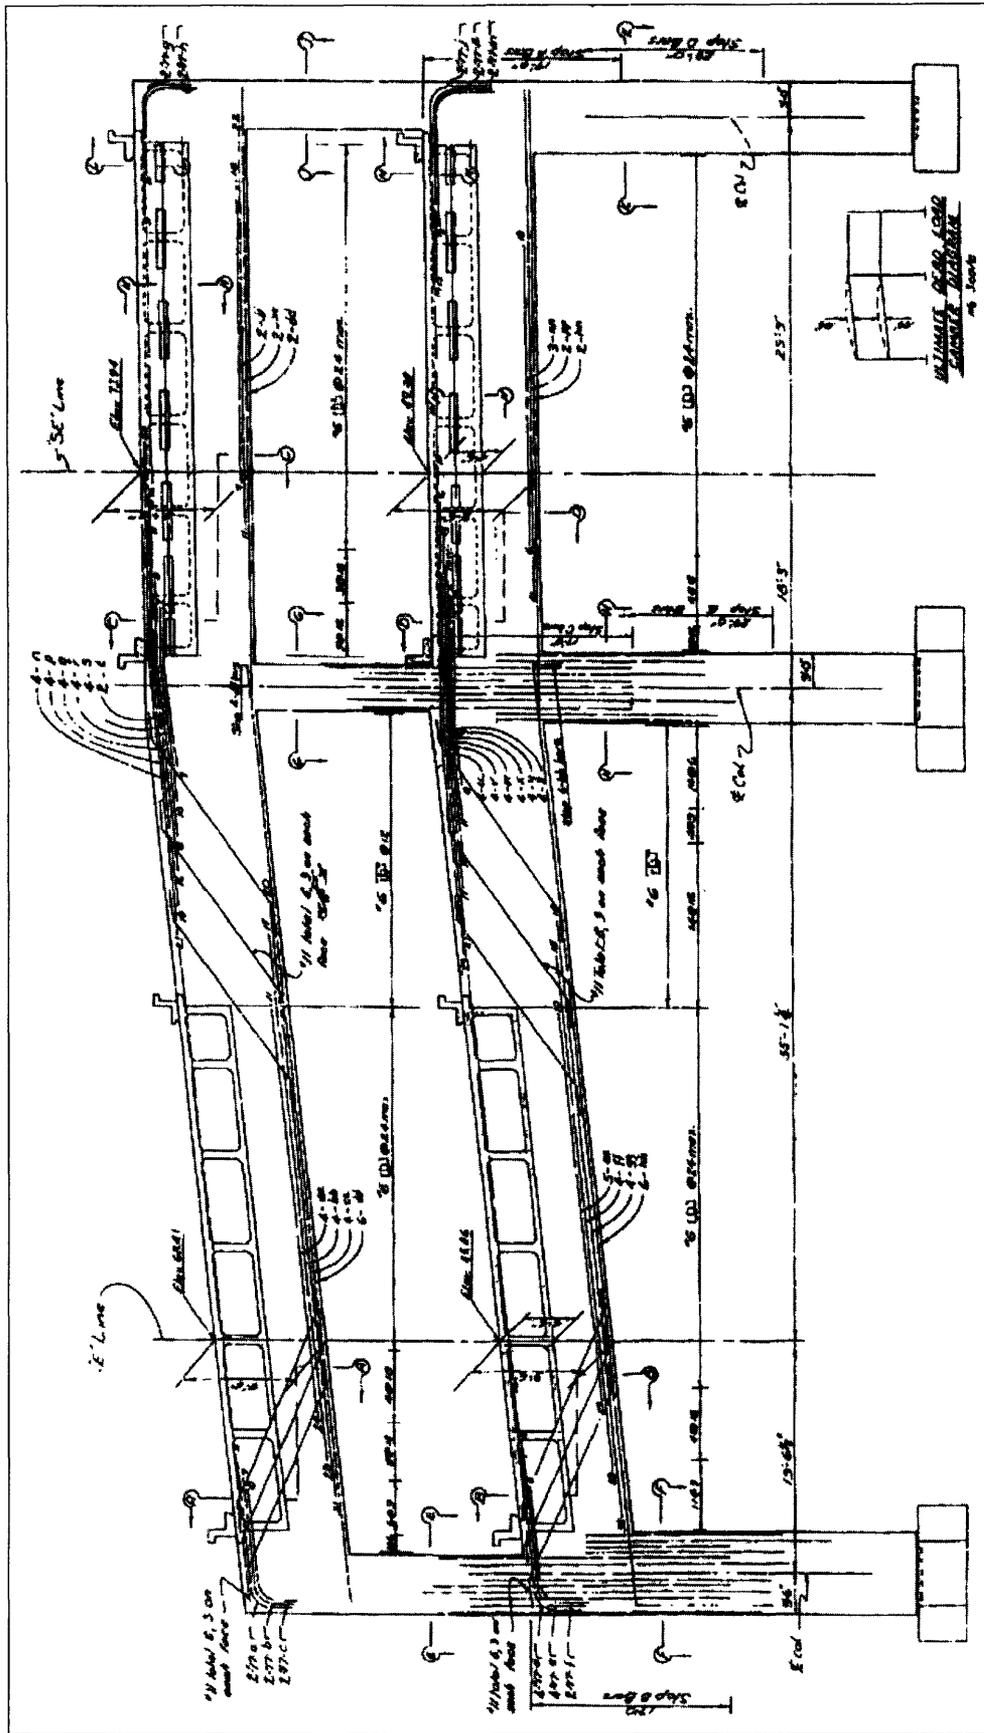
Elevation drawing of Bent 72 at Embarcadero Viaduct.
